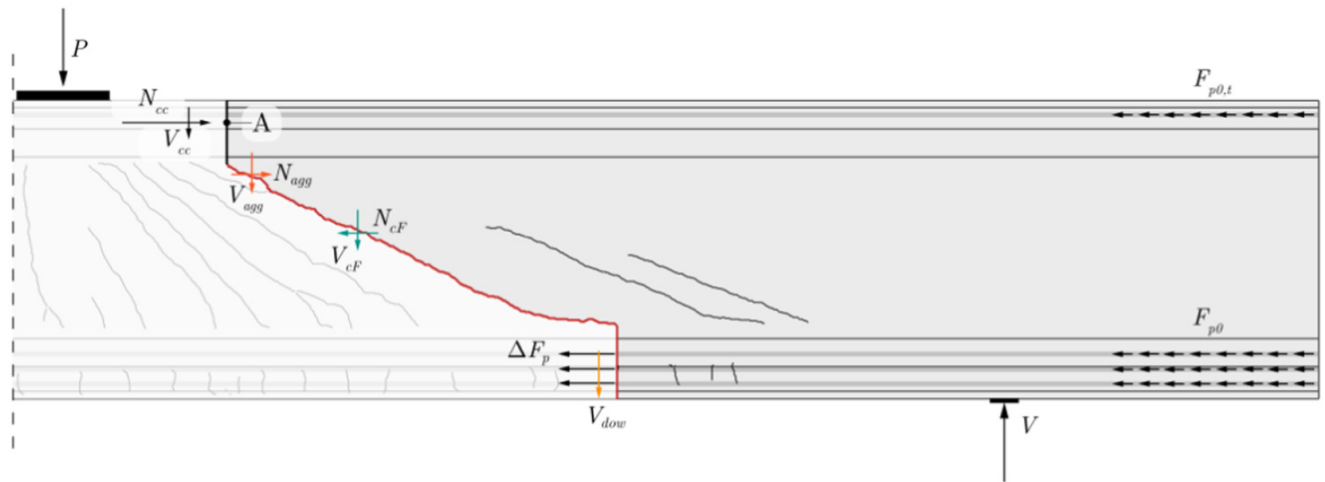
Sketch of shear resisting mechanisms in a girder without stirrups (Ruiz et al., 2024)
